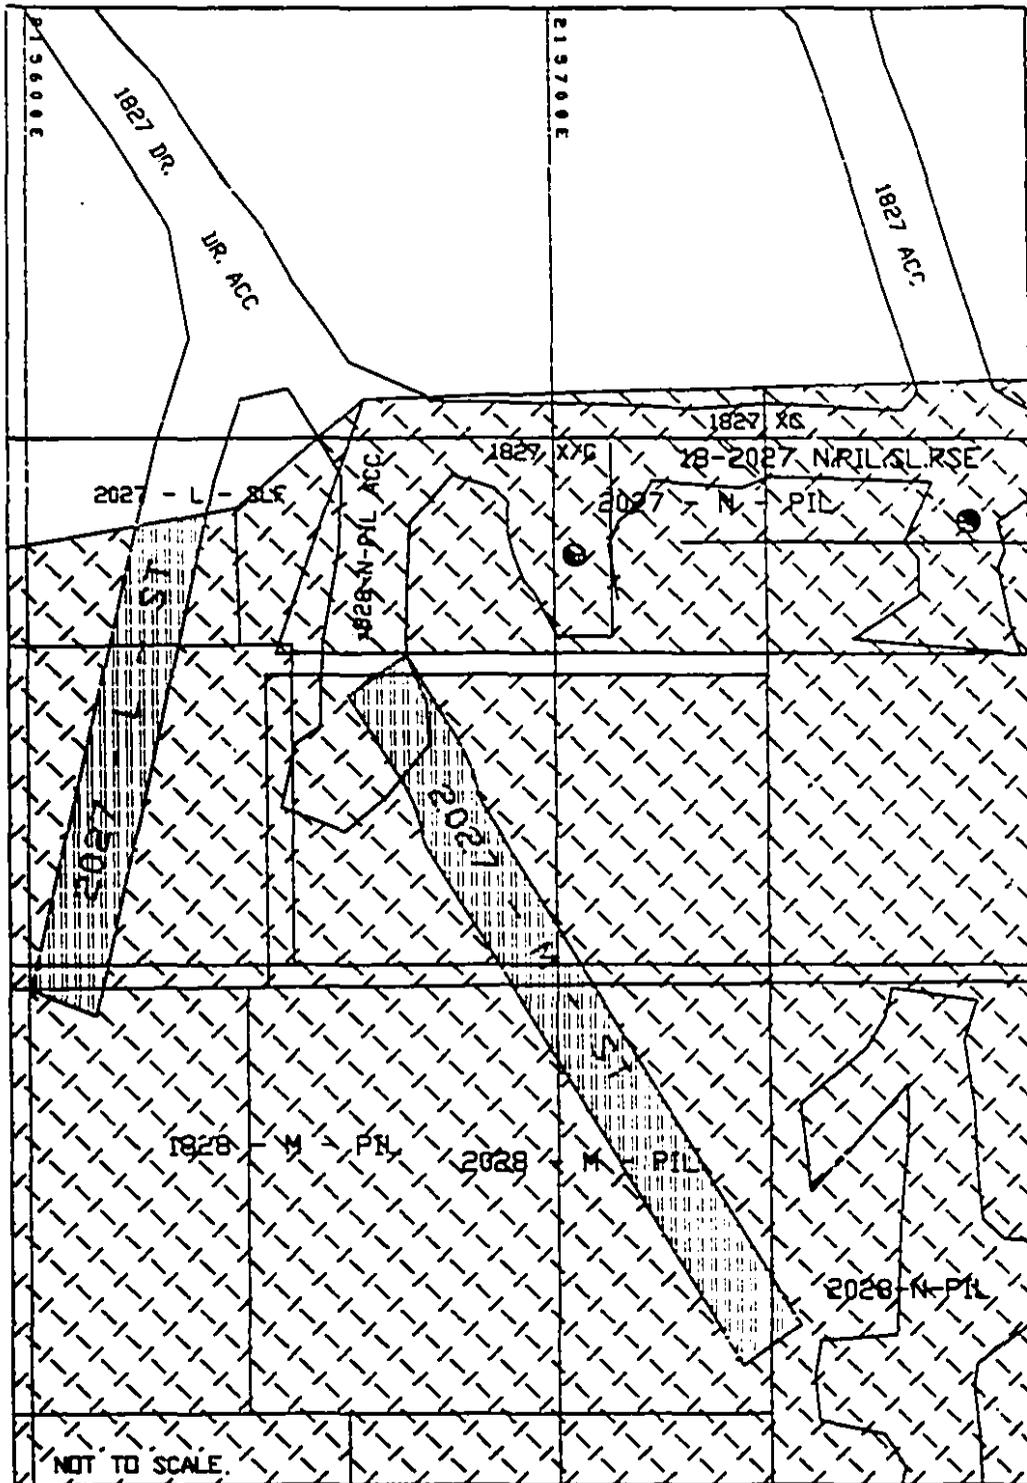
LEVEL PLAN SHOWING 2027-L-ST AND 2027-M-ST ROADHEADER DRIFTS
